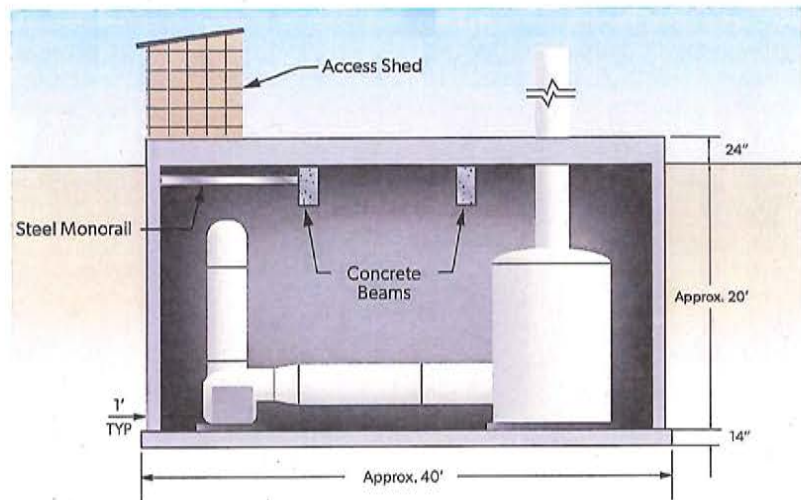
EXHIBIT E - PROPOSED GARFIELD UNDERGROUND VAULT
